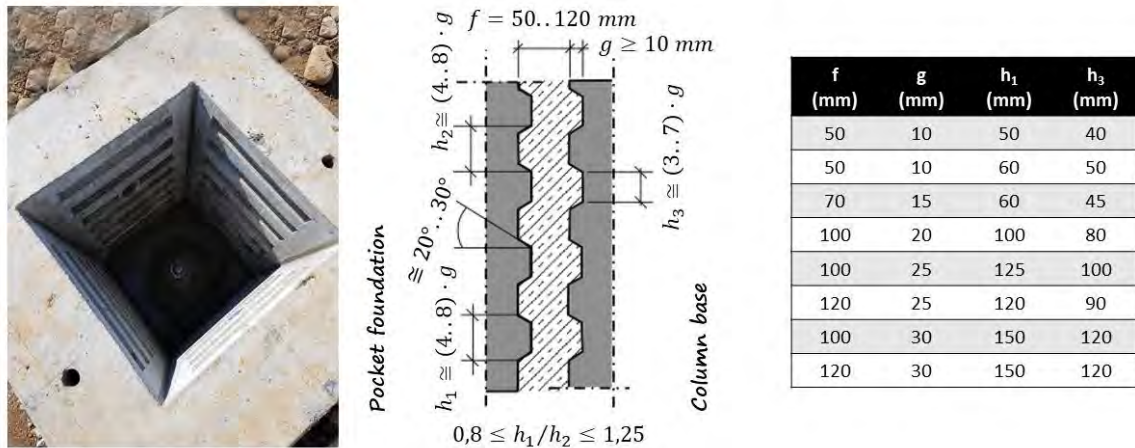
Precast pocket foundation by ©SW Umwelttechnik Romania (foto left), key geometry at the interface of precast concrete column and pocket foundation (center) and recommended values for key geometry (table right).
